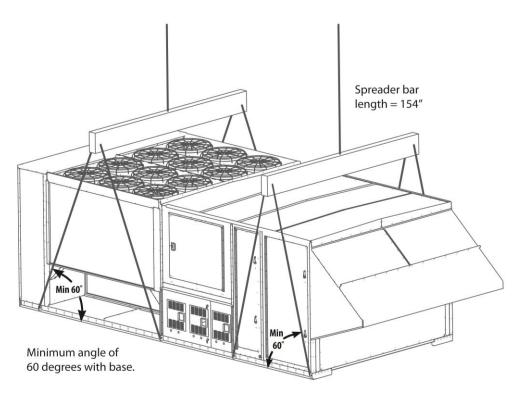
Lifting Details of a 55, 65 and 75-140 ton Unit
